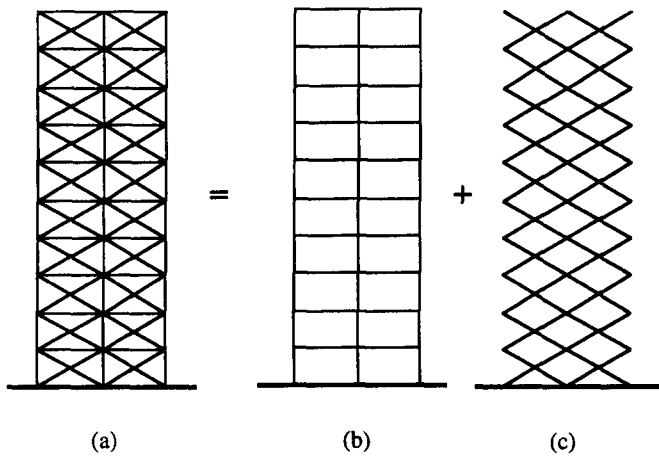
Concept of Damage-Controlled Building Structure (DCS): (a) Actual Structure; (b) Primary Structure; (c) Brace System
